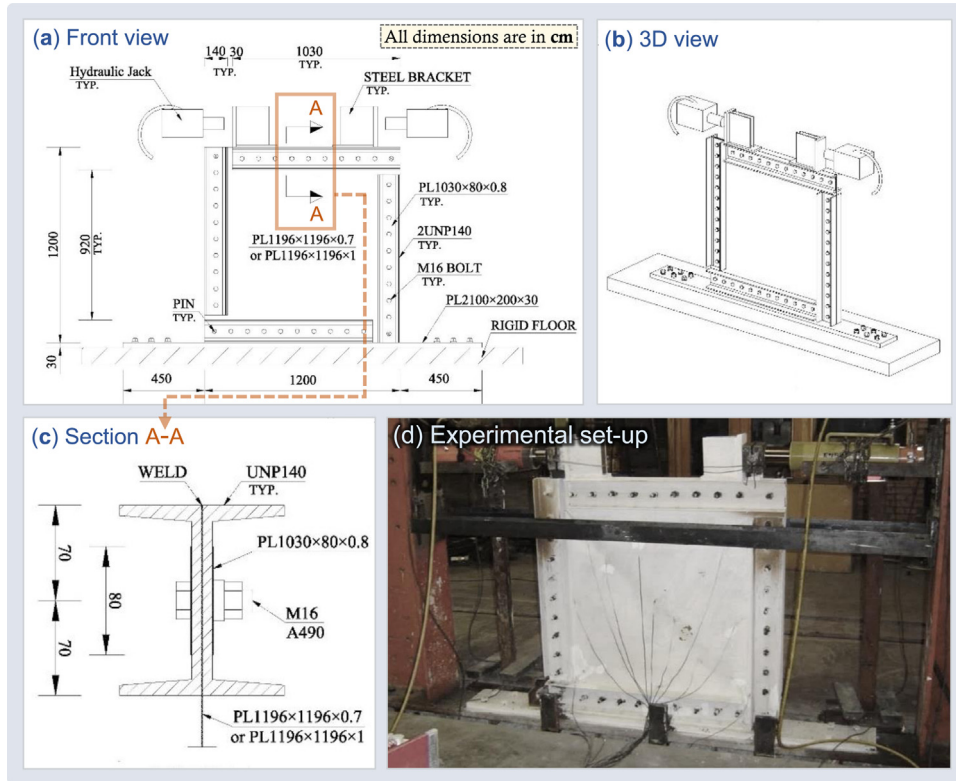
(a to c) Technical drawings of the specimens. (d) Experimental test set-up [11].
